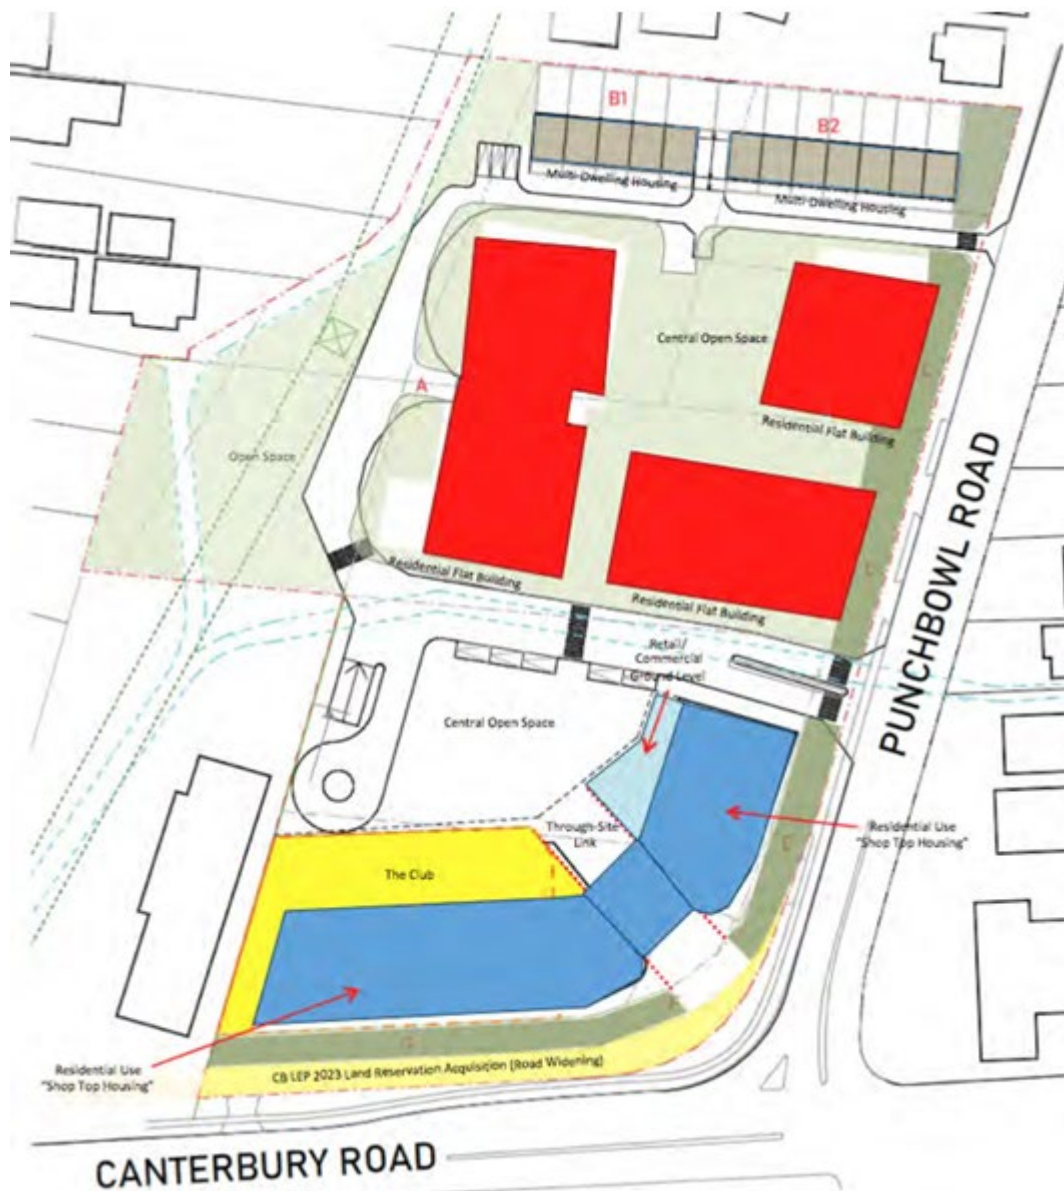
Site Plan showing the indicative concept development scheme (Council developed scheme).
